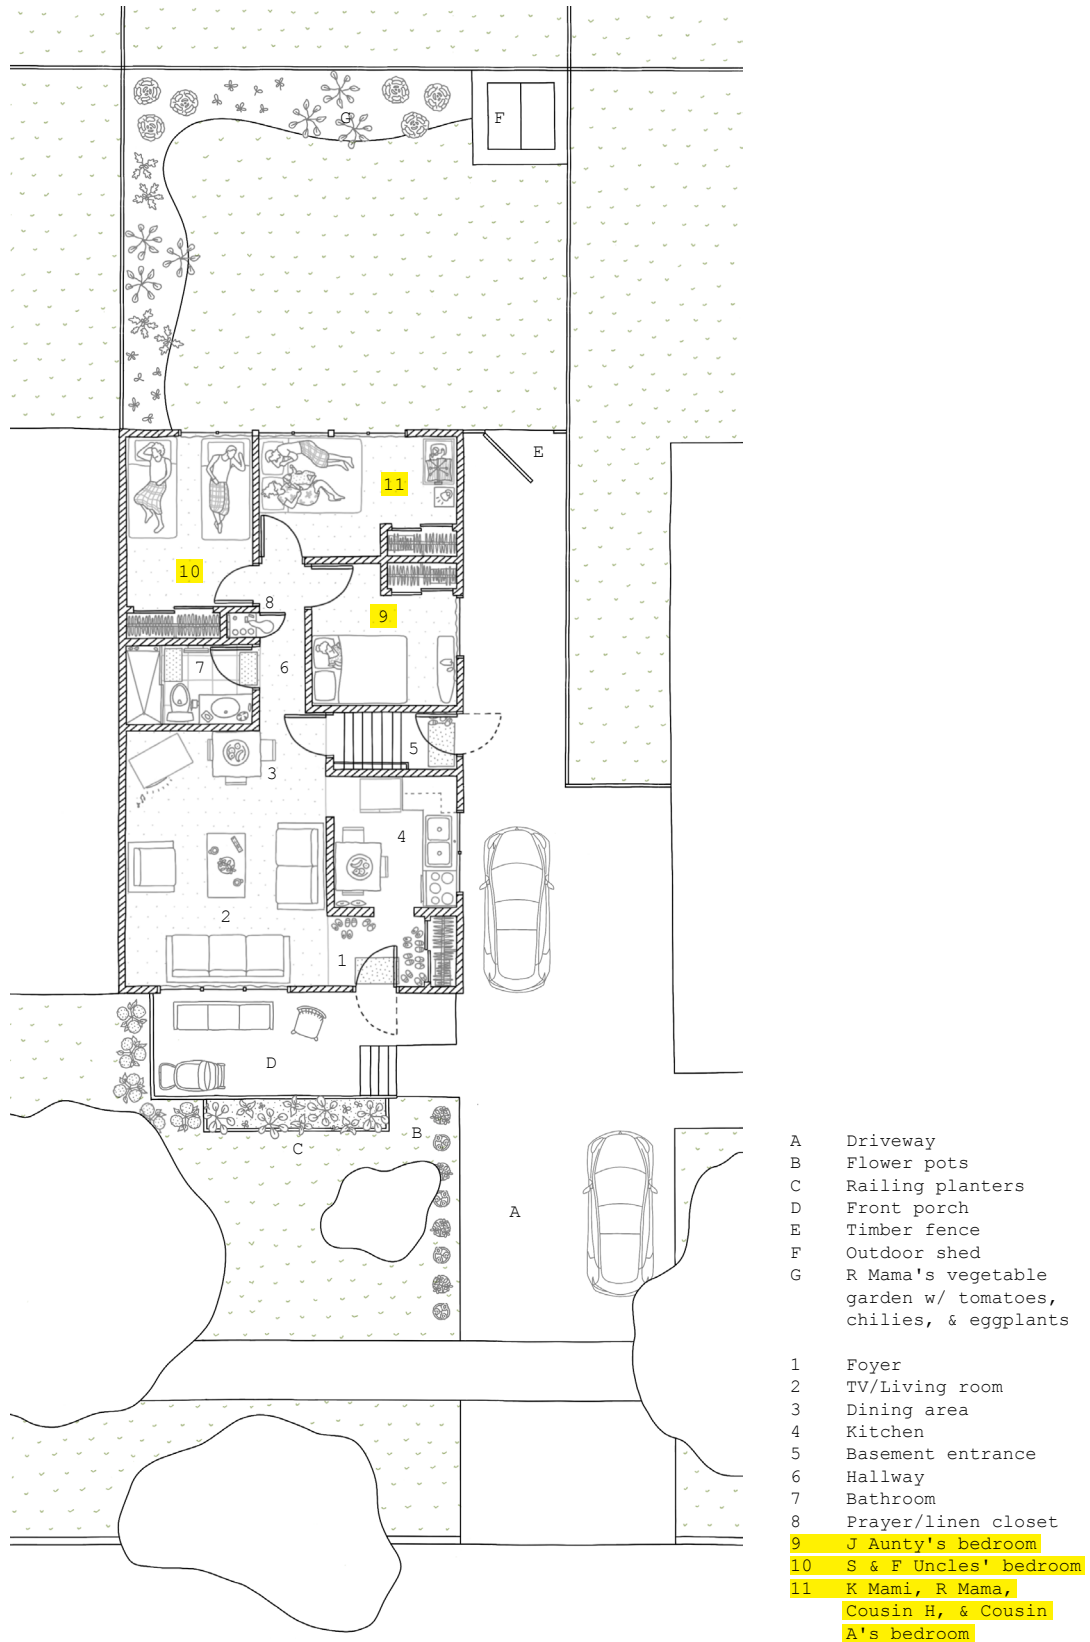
Site plan sketch highlighting how bedrooms were occupied in 1993 in the Huddleston house.
